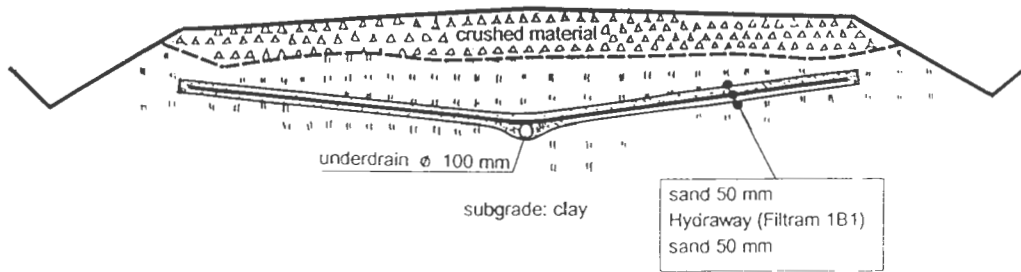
Horizontally mounted hydroway drain (Filtram 1B1).
